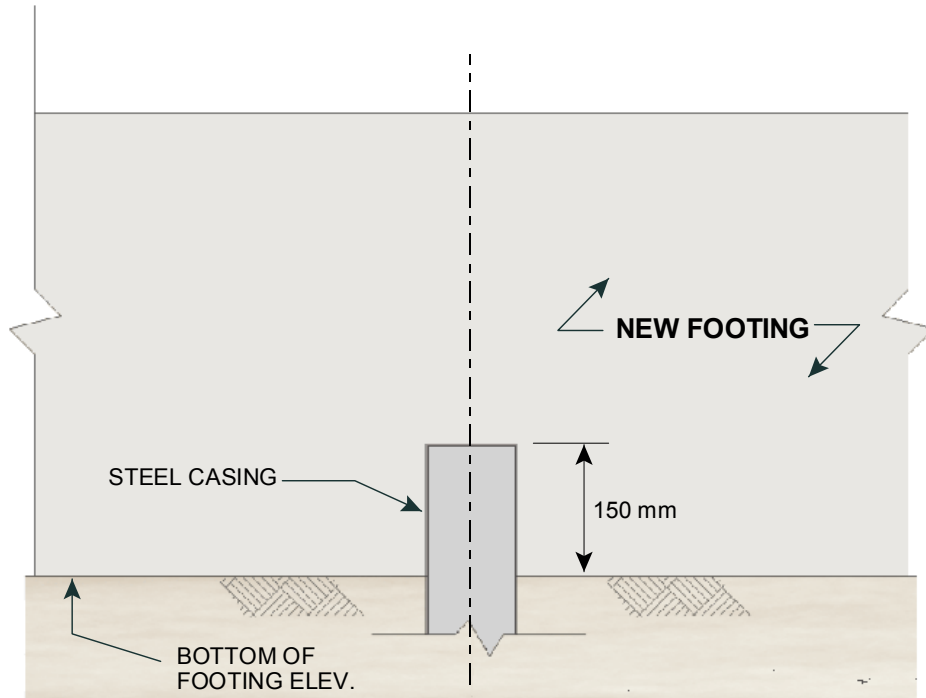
Pile to New Footing Connection Detail used for Moderate Loads (compression loads).
